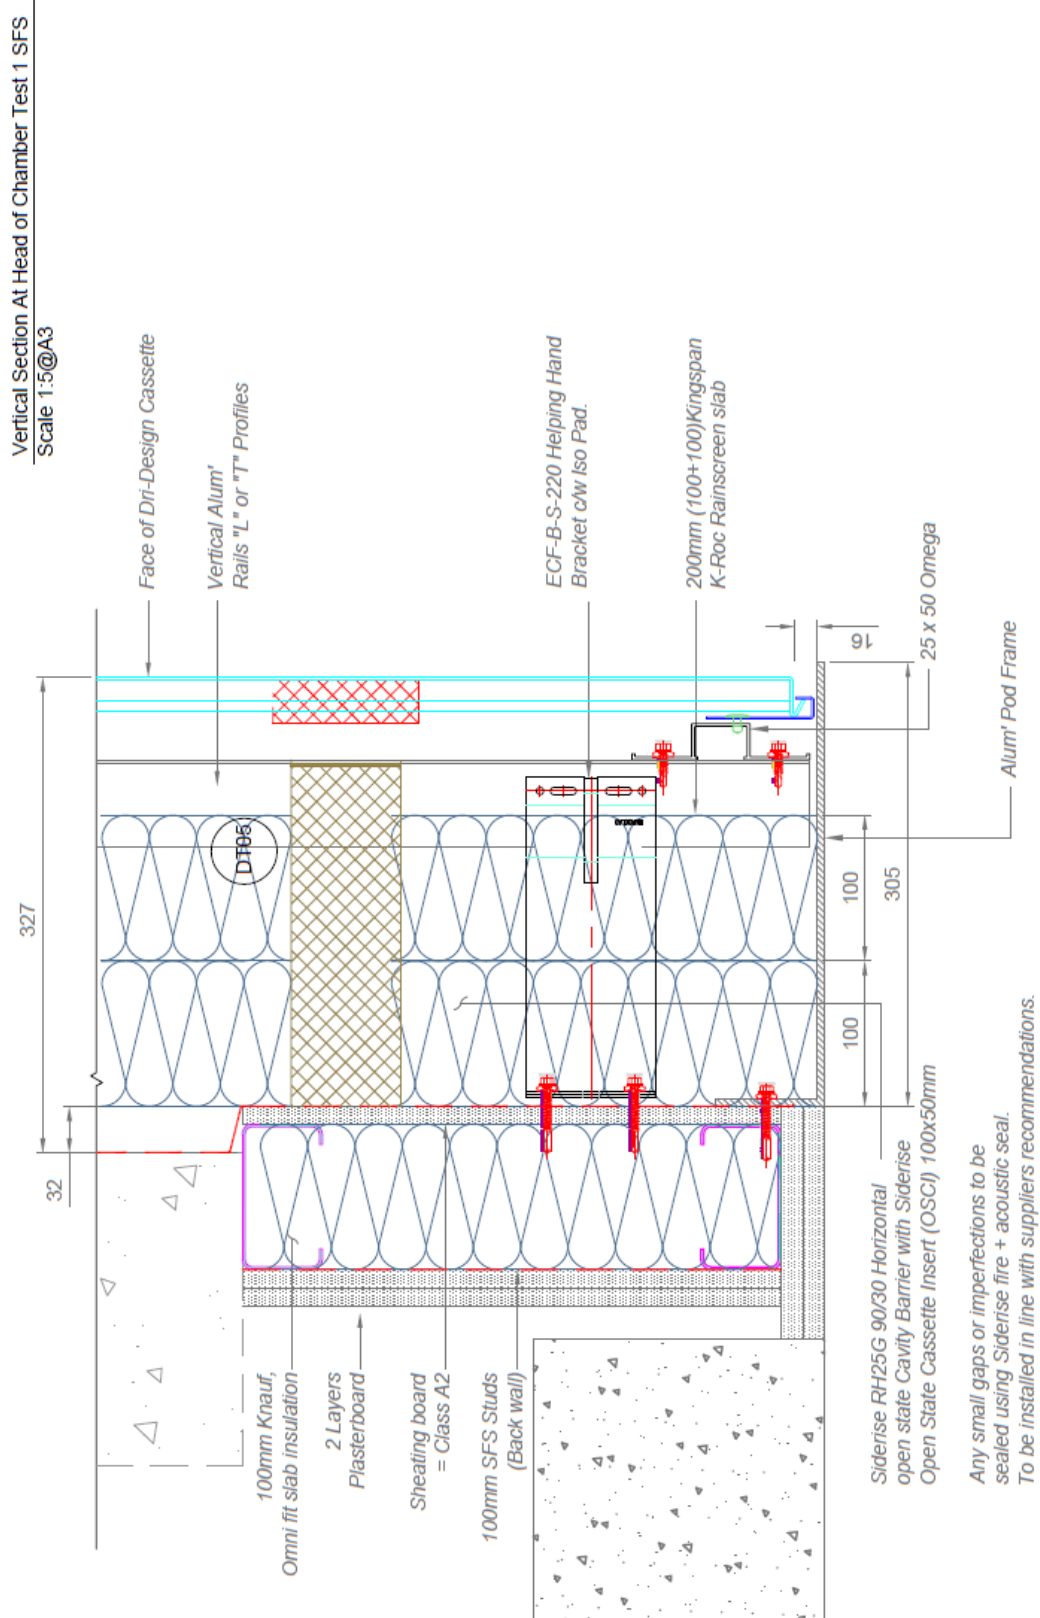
Sketch of façade system detail. Vertical section at head of chamber.
